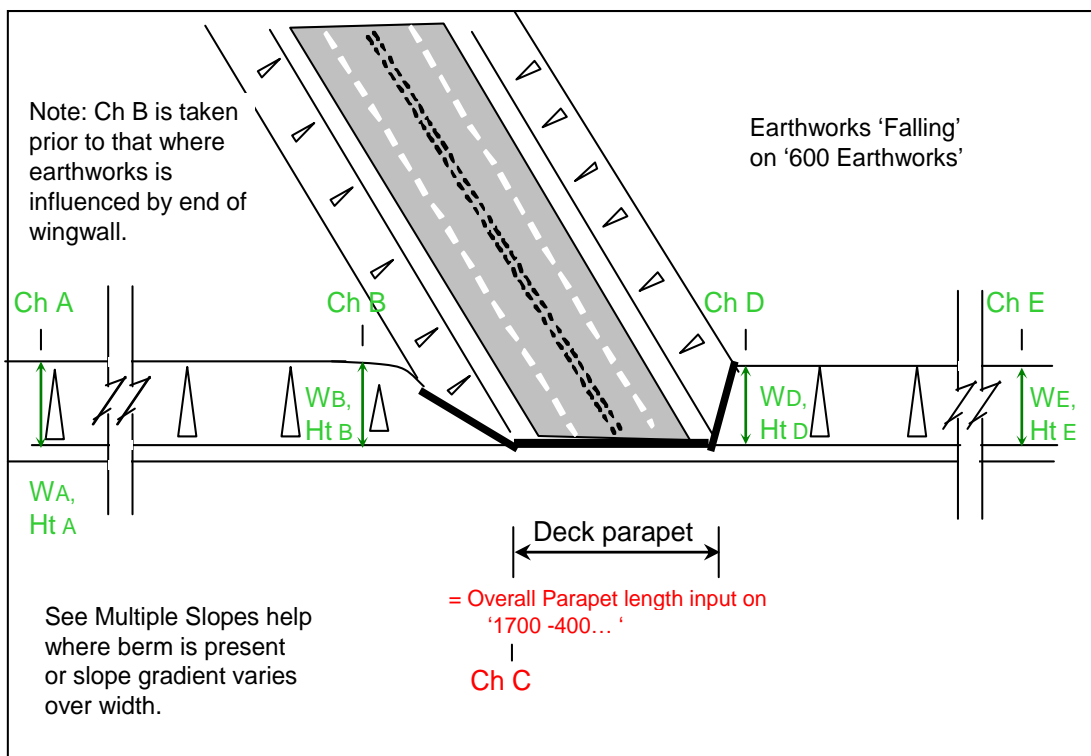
Parapet, Earthworks and Road Inputs at Underbridge with Splayed Wingwalls (Railway input broadly similar)
